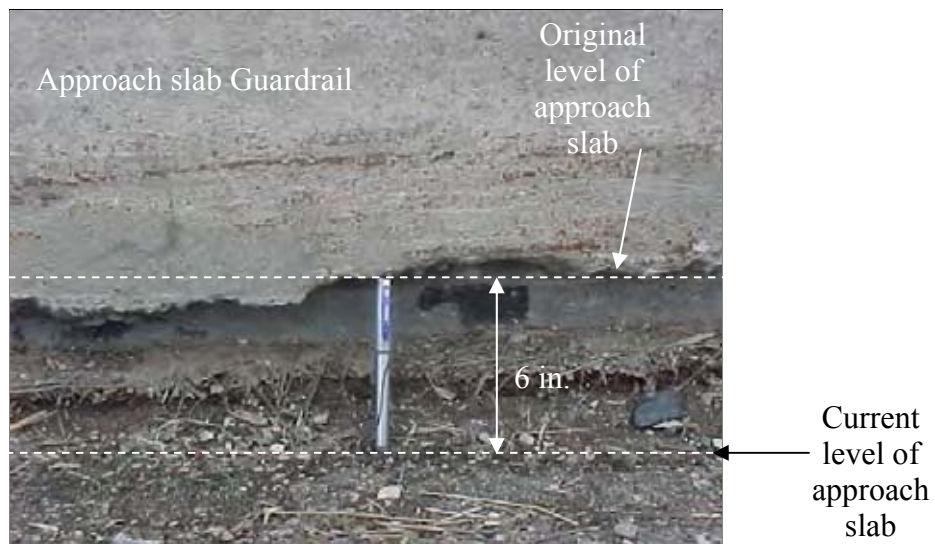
Settlement of bridge approach slab at the guardrail (South end of NBL)
